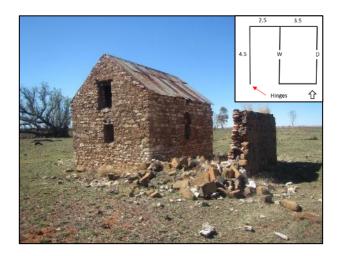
Stone ruin at waypoint 294. Inset: plan view showing door hinge location.
